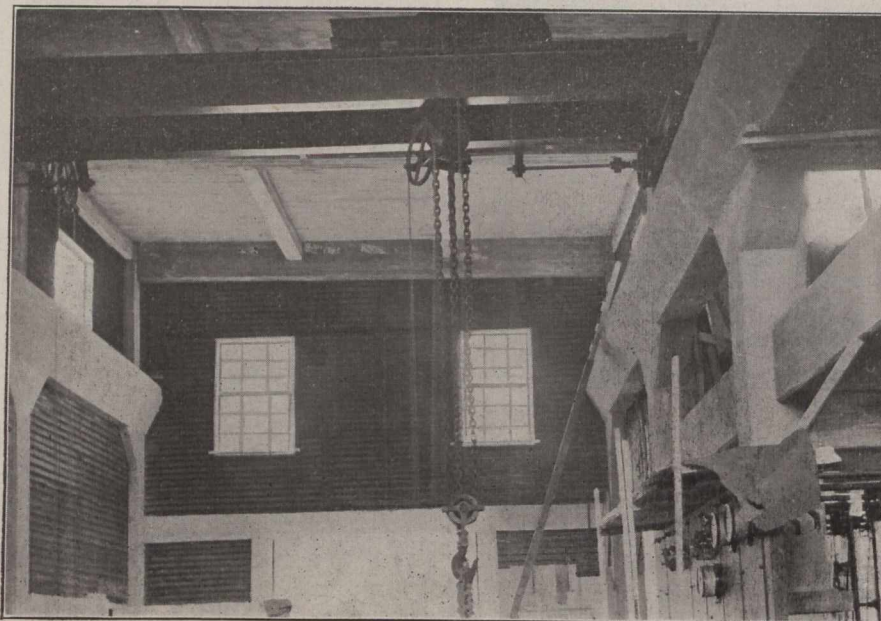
Crane Girders and Hy-rib Reinforcement Previous to Plastering.
